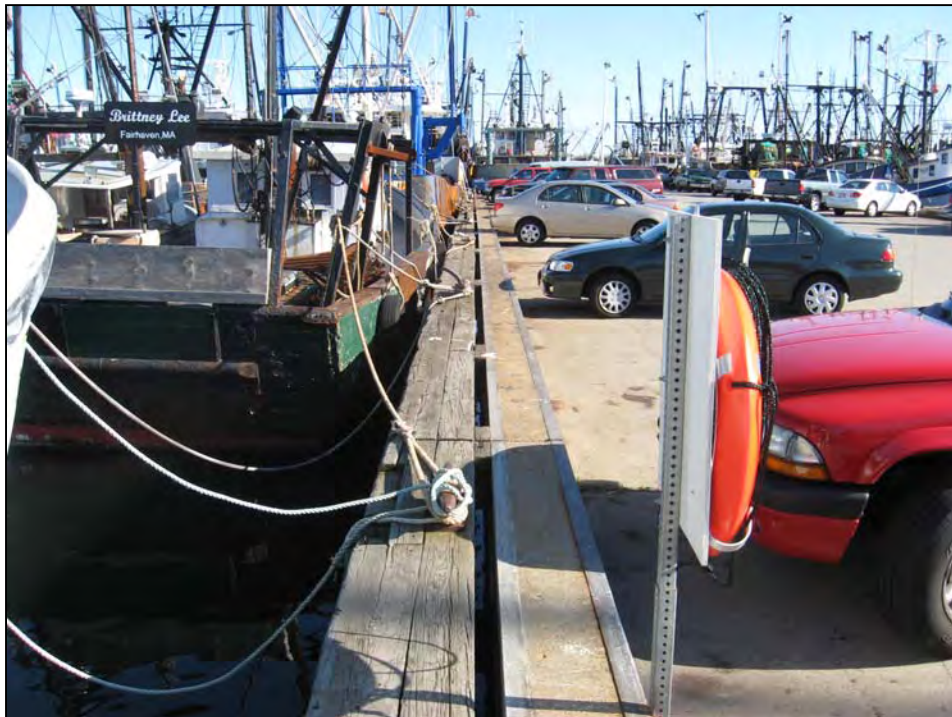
Overview of the concrete curb and fender system on the north face of the pier.
